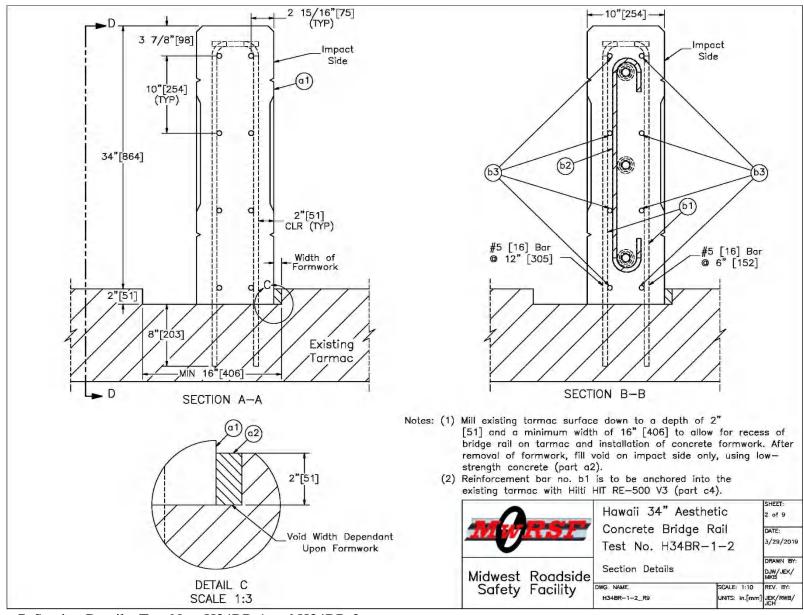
Section Details, Test Nos. H34BR-1 and H34BR-2
